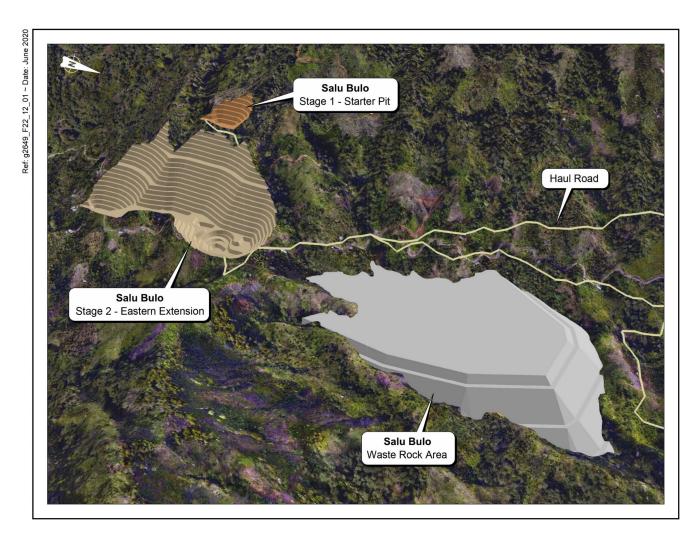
Salu Bulo staged pit designs, waste rock landforms and haul road
